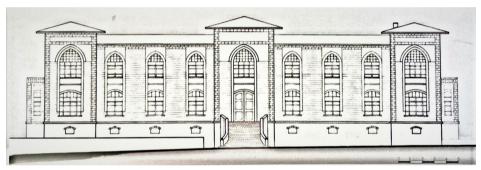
Trabzon Government House, Front Facade Drawing (Özen - Tuluk et al. 2010, 223)
